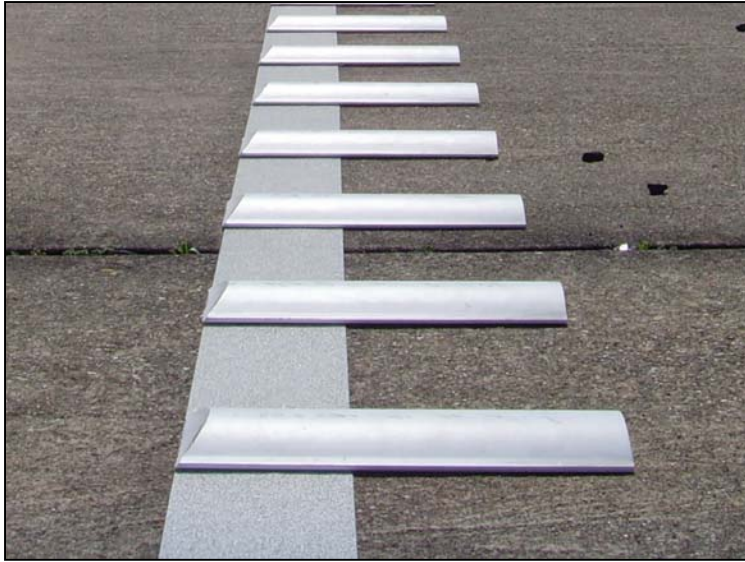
Bar-Shaped Extruded Plastic Rumble Strip.
